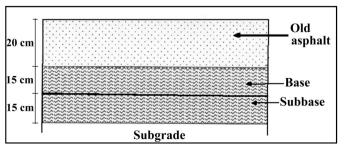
Pavement cross section before the overlay and the interlayer construction
